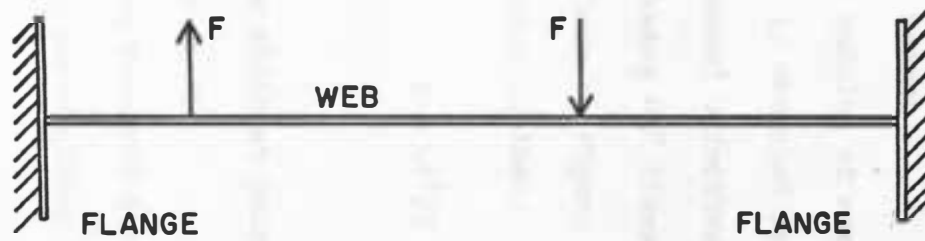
Construction Bracket Mounted on Bridge Girder Web
